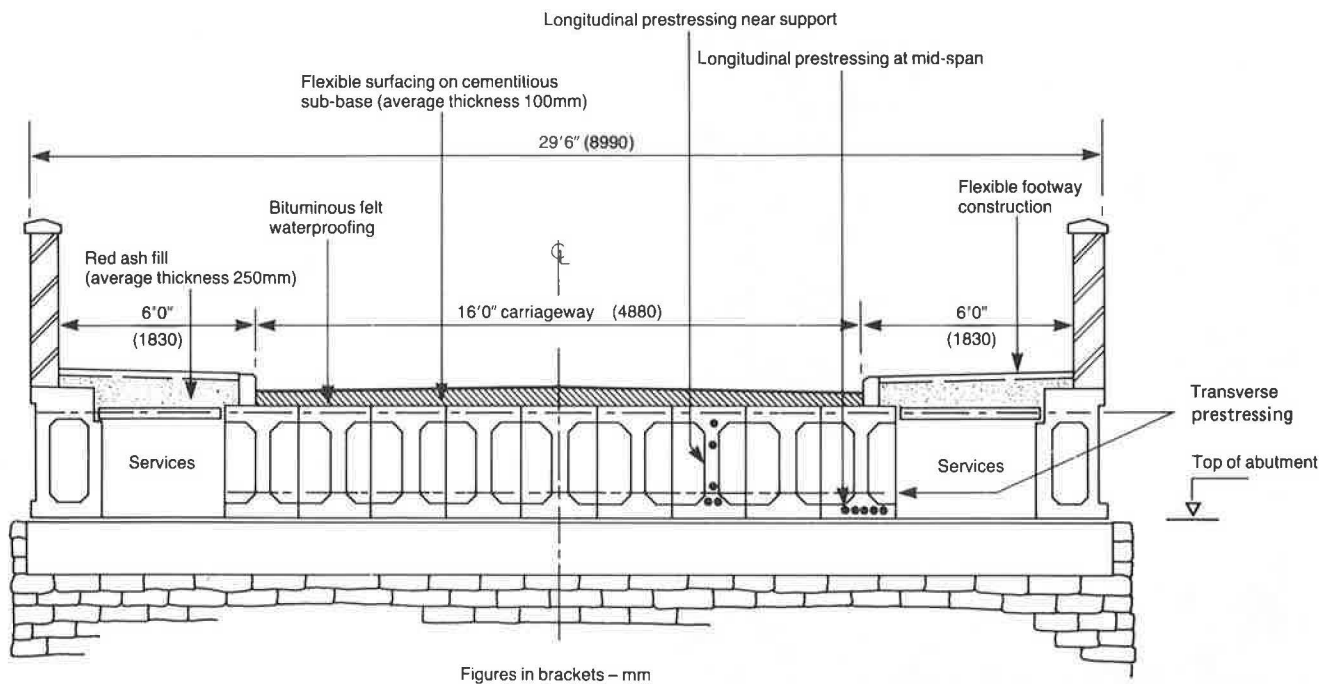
Cross section of Ynys-y-Gwas bridge (1953-85).
